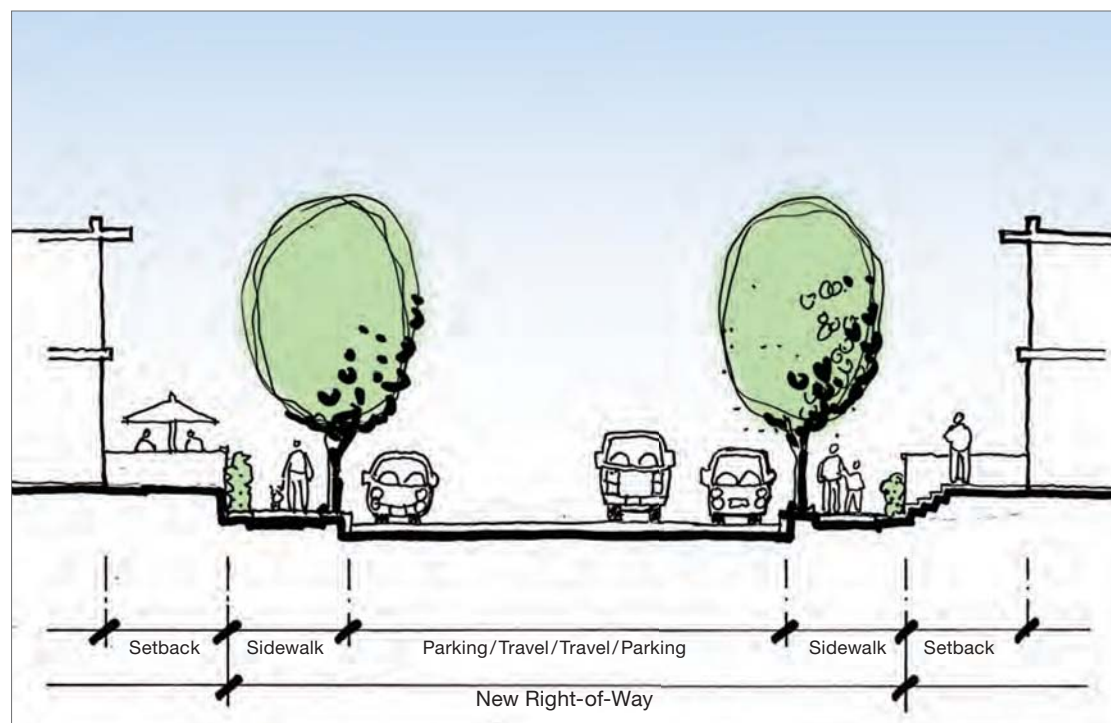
New Local Street, Proposed Cross Section (see Section 4.1 for recommended dimensions)
